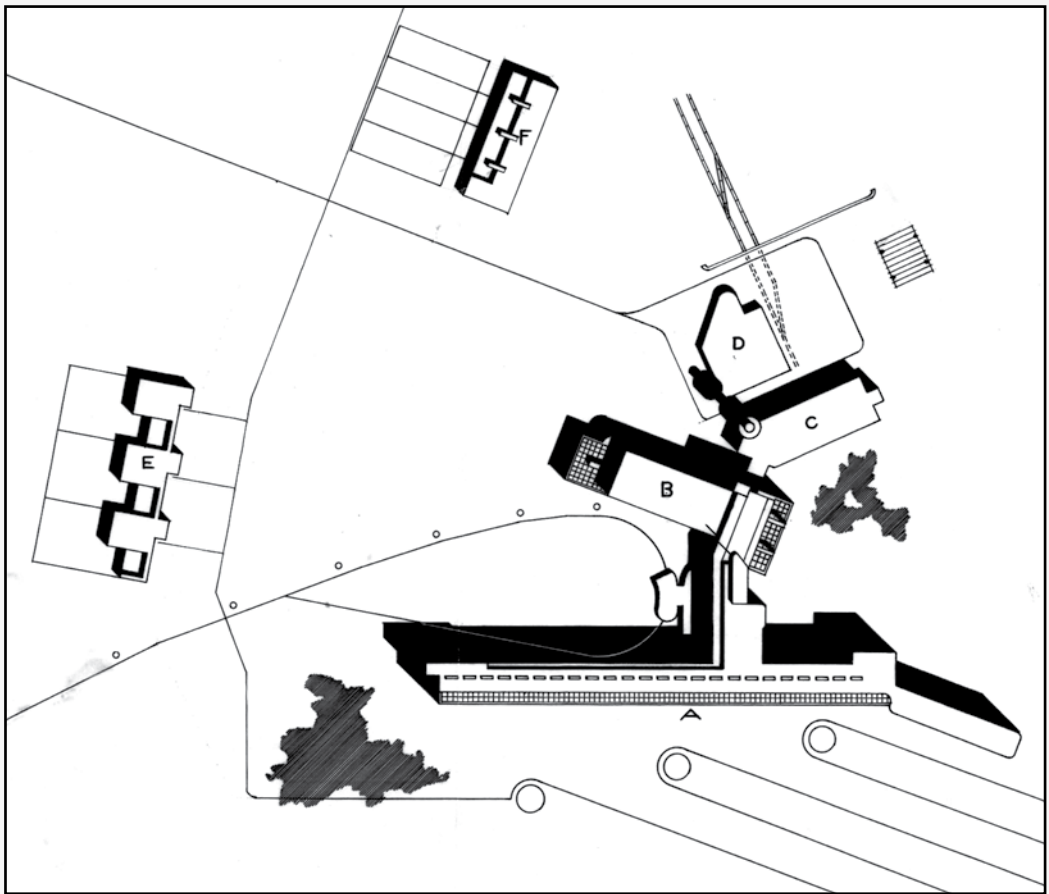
Site plan of the completed hospital showing the main building and its wings A–D, the Junior Physicians' and Administrative Director's terraced house facing the hospital entrance and workers' apartment building. Detail of drawing No. 50-759, the drawing has been edited. AAM.
